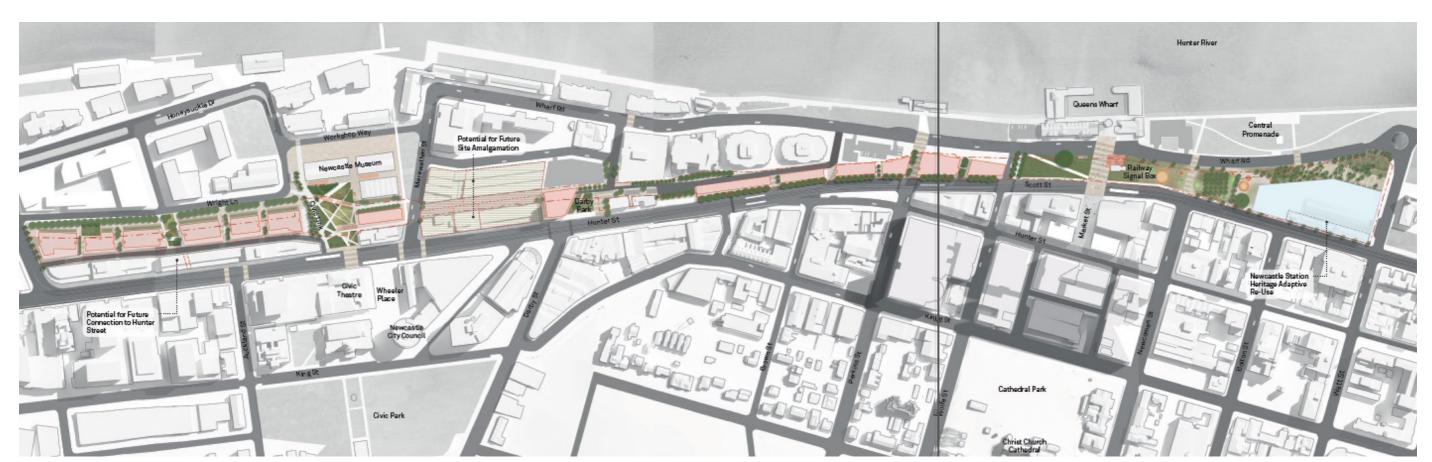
The Site Parcel Areas and Preliminary Master Plan (Image Source: Hassell 2016)
